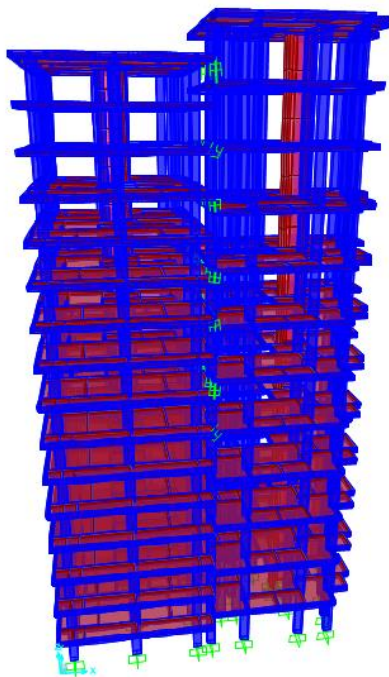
3D View of G+15 building with 3.2m floor to floor height & G+11 buildings with 4.5m floor to floor height with FVD
